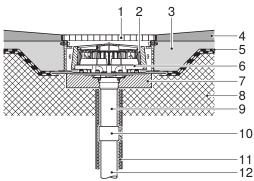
Installation in a solid roof uninsulated with bitumen roof foil, suitable for parking decks
